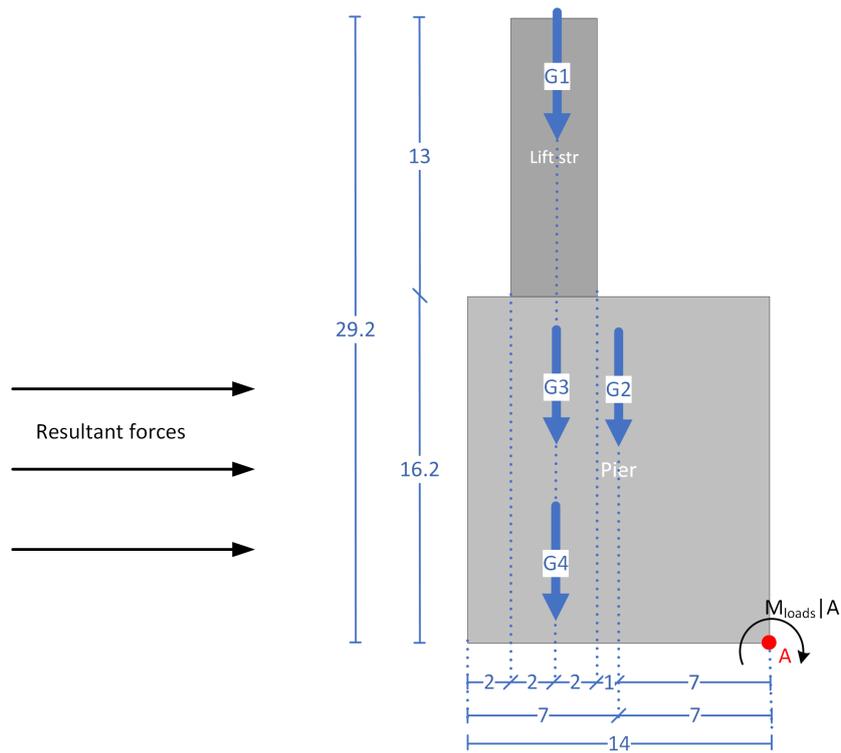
Cross section with loads of the storm surge barrier for LC1
